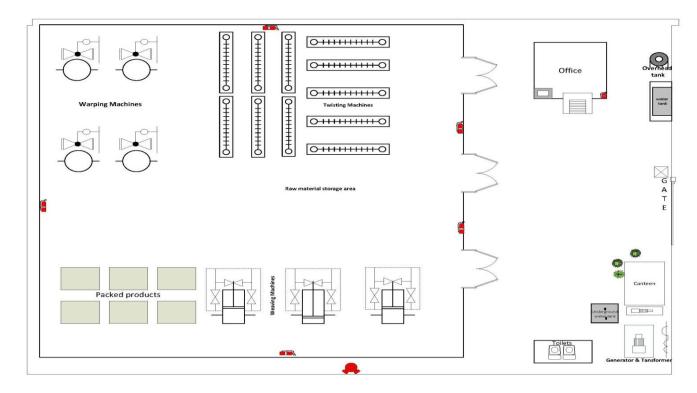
Factory layout drawing of RANDOO (MYANMAR) SILK CORP., LTD
